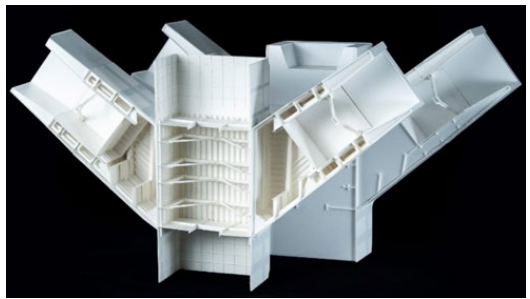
Scale models of springing steel shell sections with steel shell concrete filled structures applied
